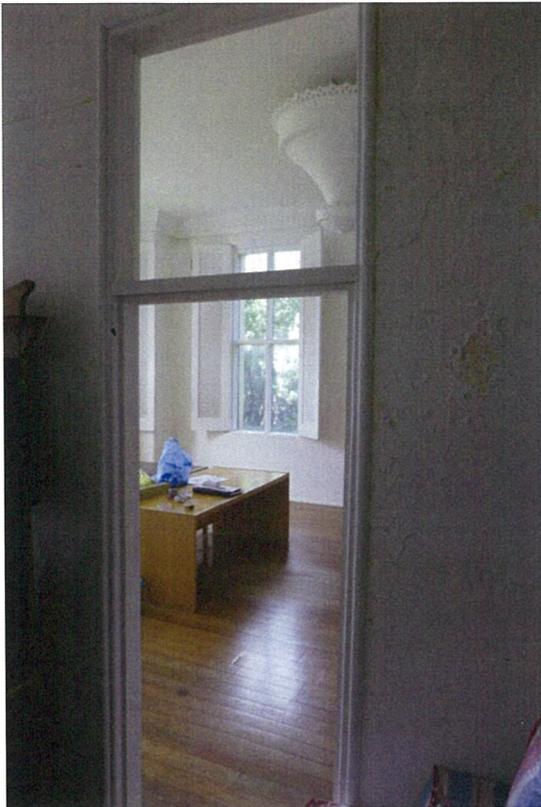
Some of the damage evident on the plaster in the hallway, looking into the lounge.
